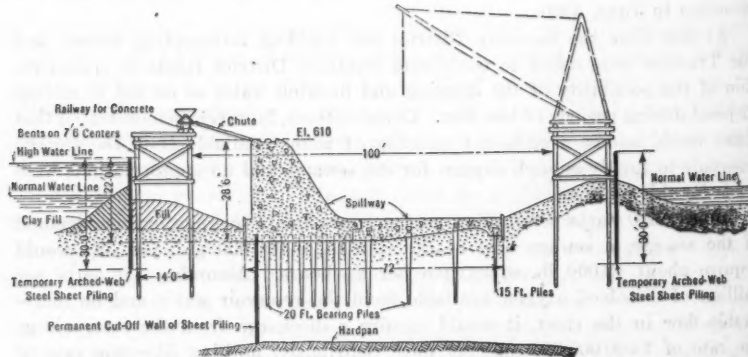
CROSS-SECTION OF COFFER-DAM FOR CONCRETE SPILLWAY OF DAM, DECATUR, ILL.
